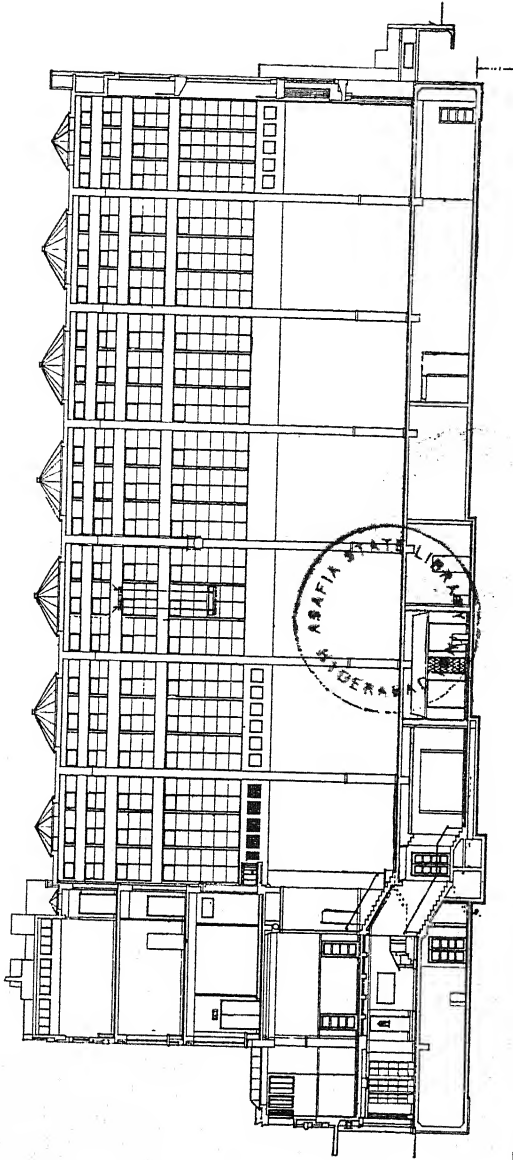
Longitudinal section of the Hall of the Royal Horticultural Society, London, by J. Murray Easton and Howard Robertson. The arrangement of the floor levels provided the key to the problem of providing maximum floor area on a restricted site.
